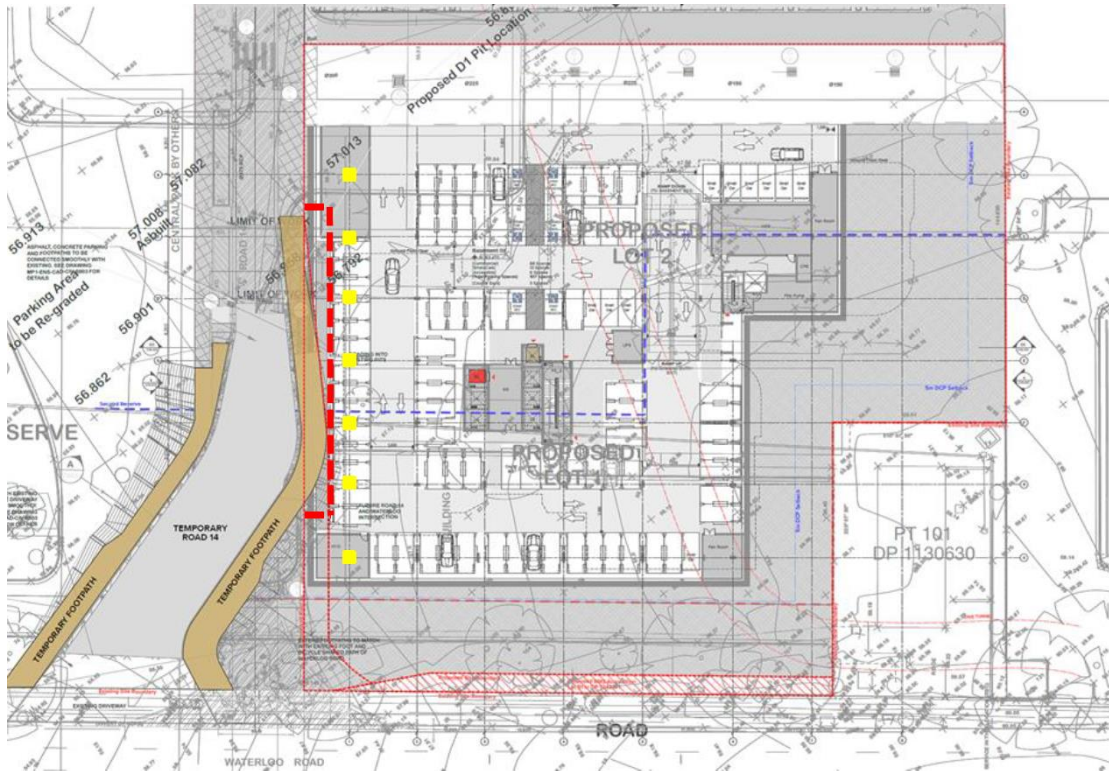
Overlay of the temporary road over the basement plan. Red dashed line indicates temporary sheet pile shoring wall. Yellow squares indicate main building. Source: Staged Construction Management Report prepared by EI Australia dated 15th July 2021.
